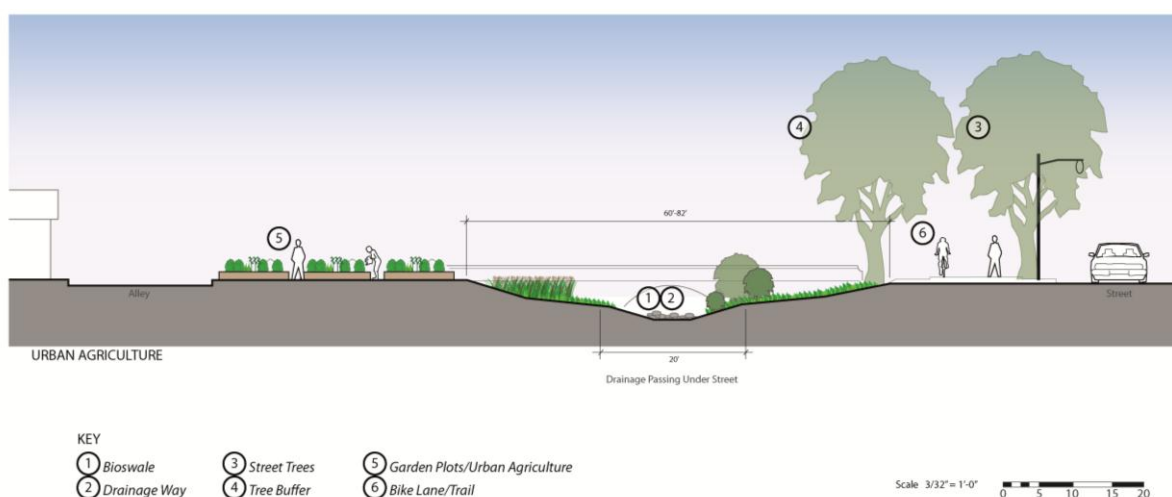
Conceptual Greenway Corridor Cross Section View on W. Clark Street from N. 30th Street to N. 27th Street
